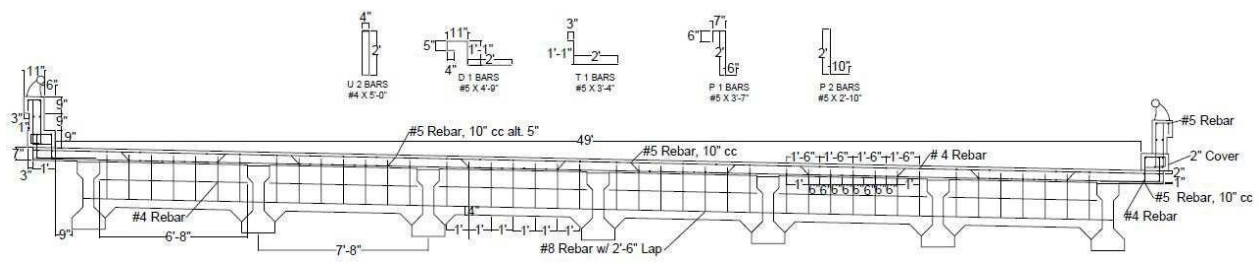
Whole section of the bridge section where girders A and C were taken
